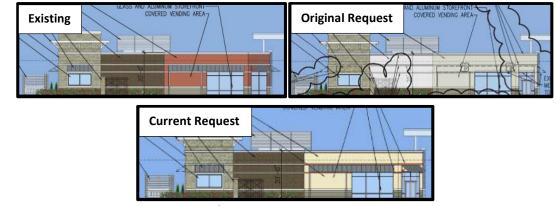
Building M East Elevation (facing mall entrance corridor, between Buildings M & N)
